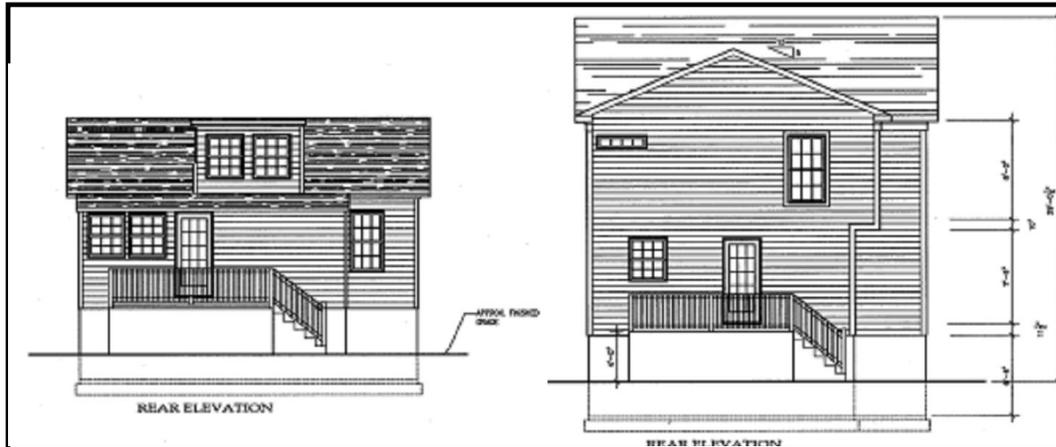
Side by side comparison, rear elevation existing and proposed. Source: Applicant.
